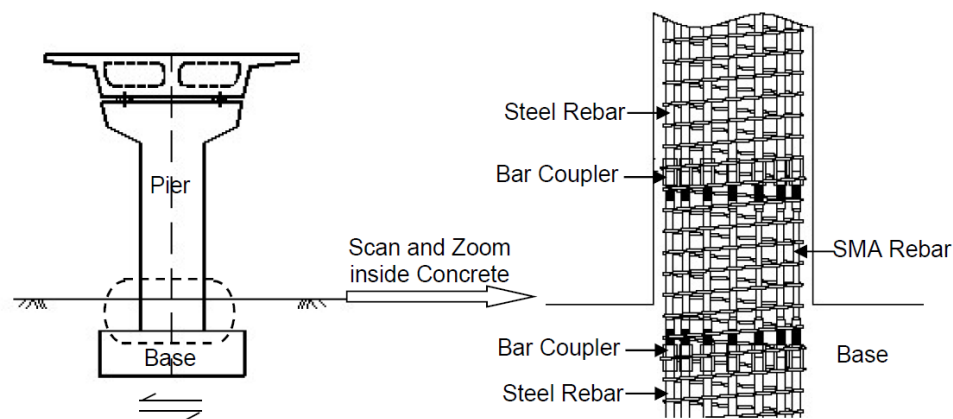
Detailing of bridge pier with coupled SMA-steel reinforcement (Alam, Nehdi and Youssef, 2008)
